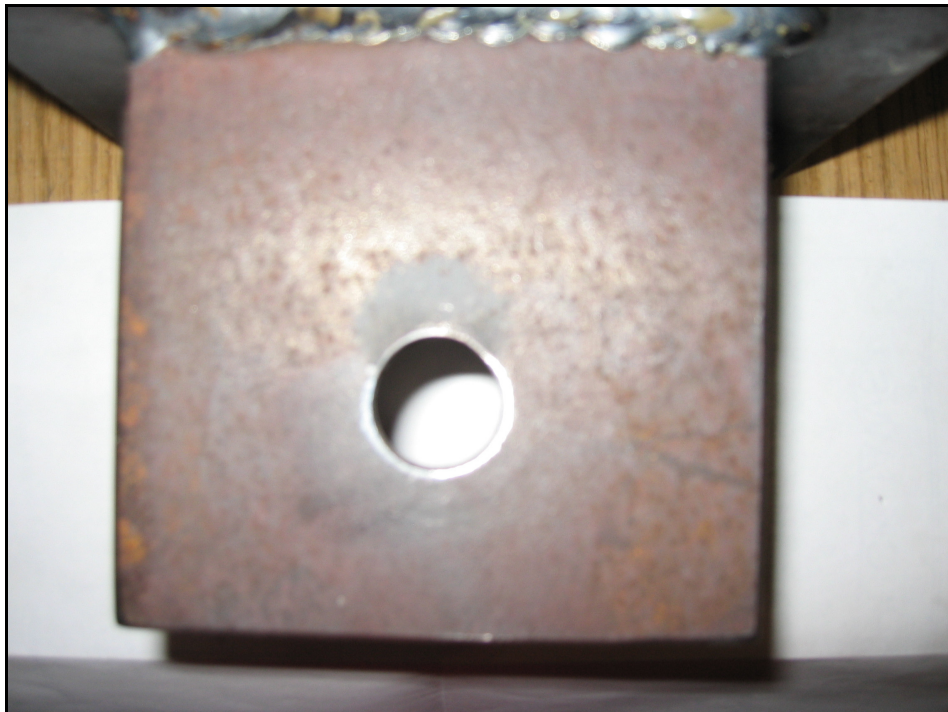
Bolt Hole Deformation, 3/8 in. Plate
